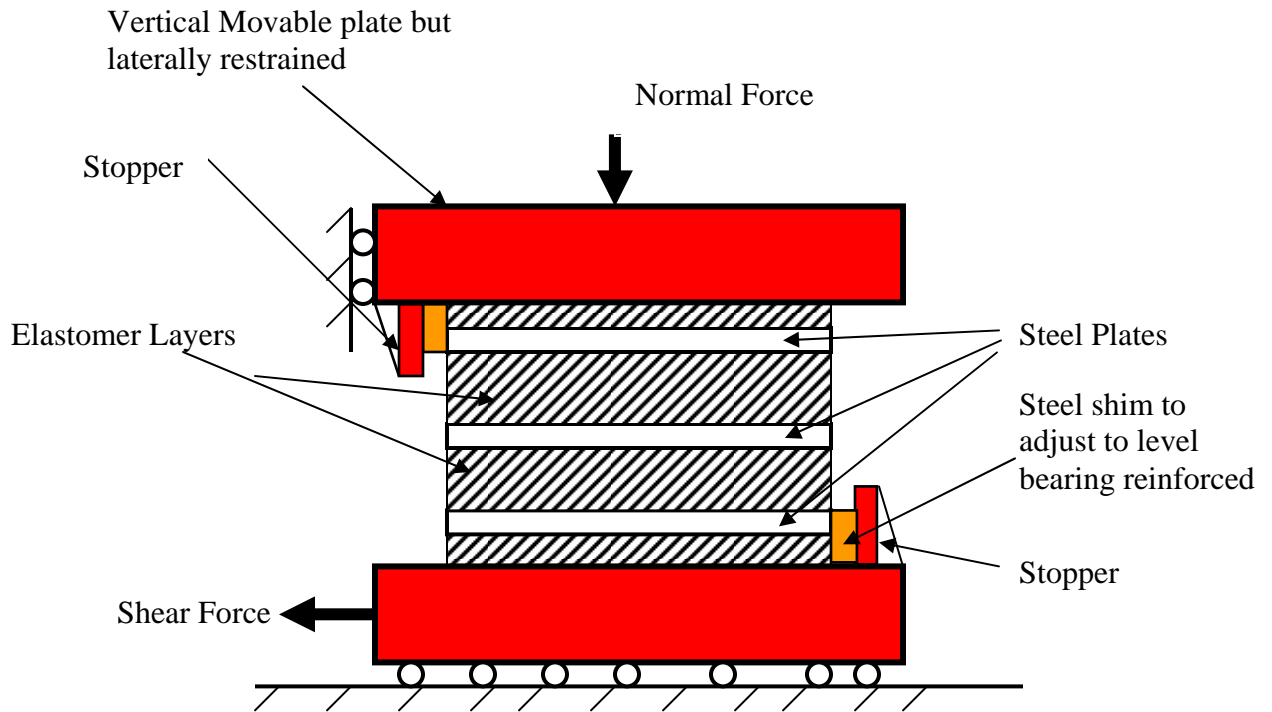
Schematics of Proposed Shear Testing Set-up
